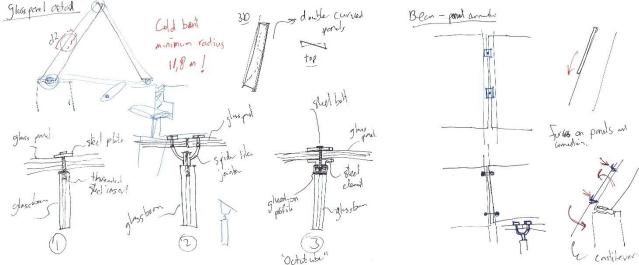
The first sketches for the panel to beam detail. Source: own ill.
